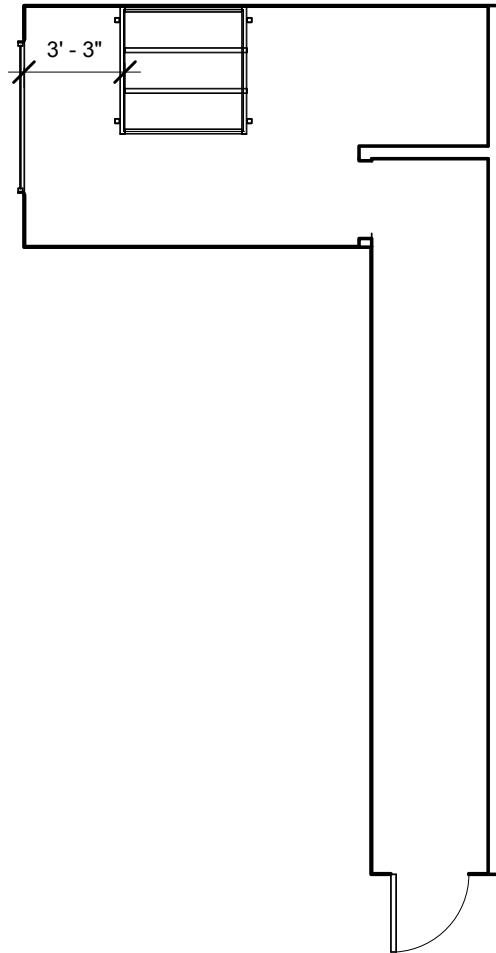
Floor plan showing dimensioned location of the steel platform used to support the pallets fuel load within the fire room.
